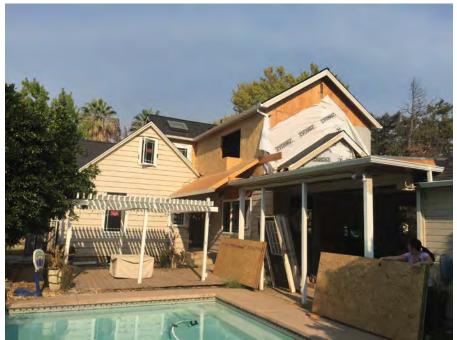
View south of north elevation depicting large room addition, second-story addition, and new windows.
